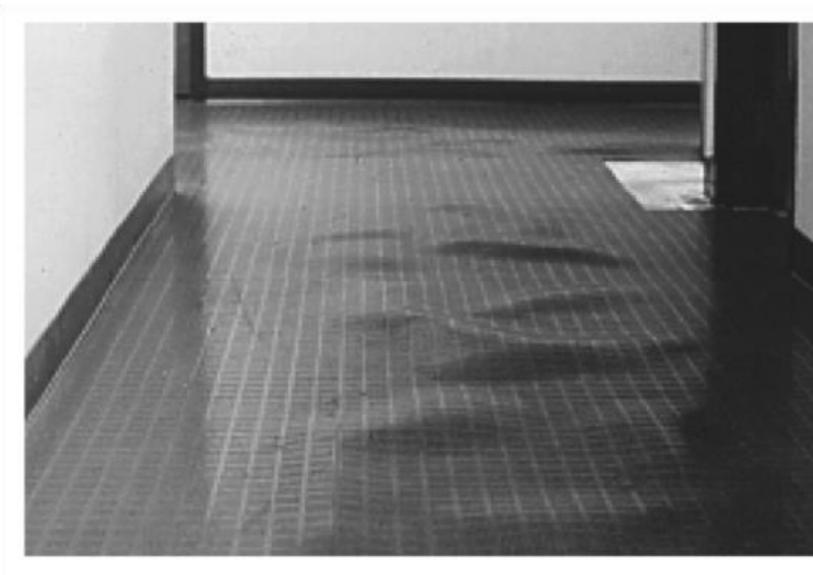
Debonded sheet flooring due to moisture in the concrete slab. (Courtesy of Peter Craig and Herman Protze III.)
